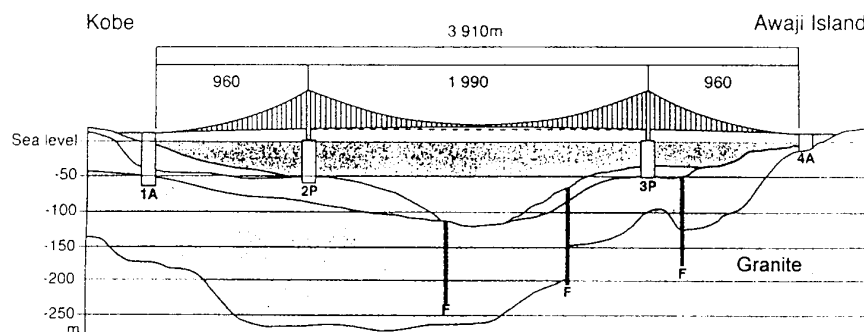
Schema of the Akashi Kaikyo bridge in Japan.
